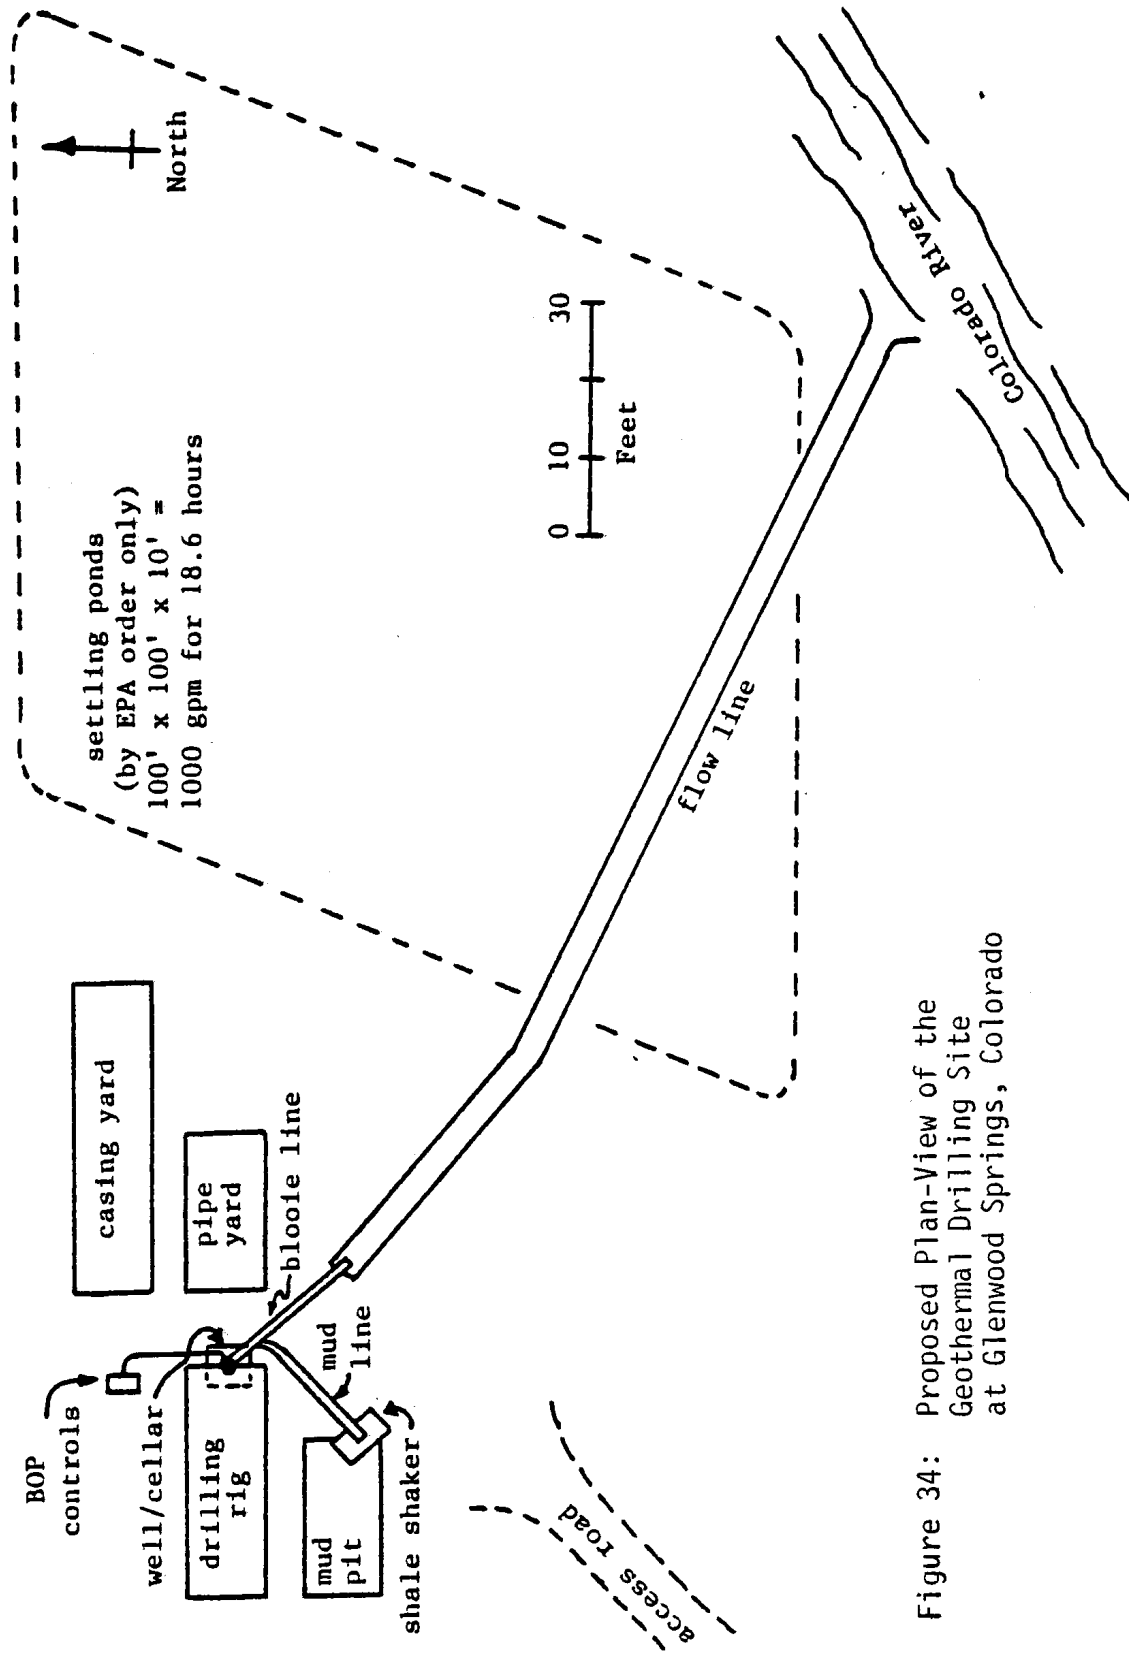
Proposed Plan-View of the Geothermal Drilling Site at Glenwood Springs, Colorado
